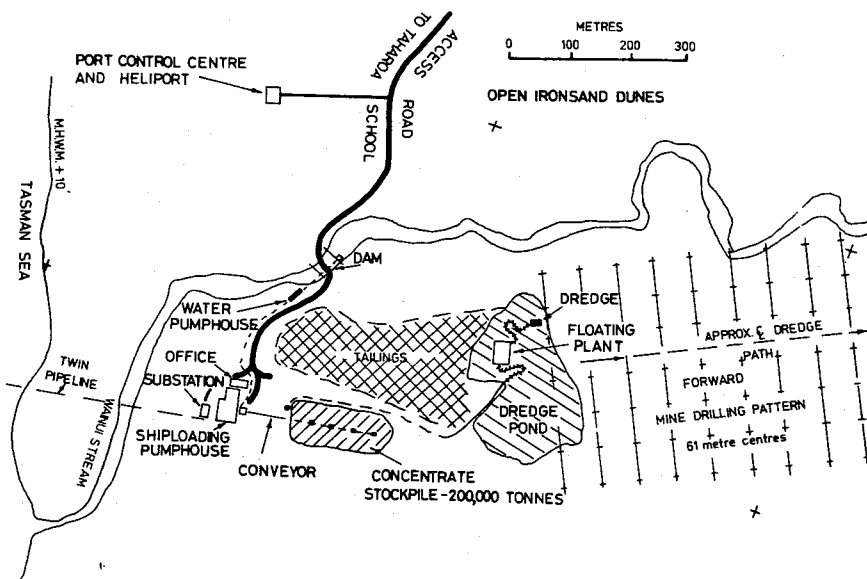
Taharoa ironsands operation—general arrangement—site plan.
